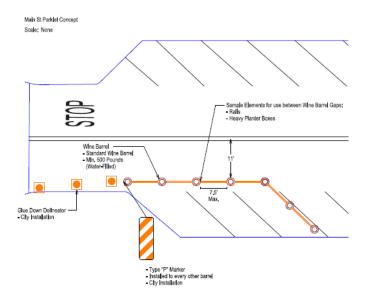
Typical layout plan for a 3-angled parking stall wine barrel parklet on Main Street.
